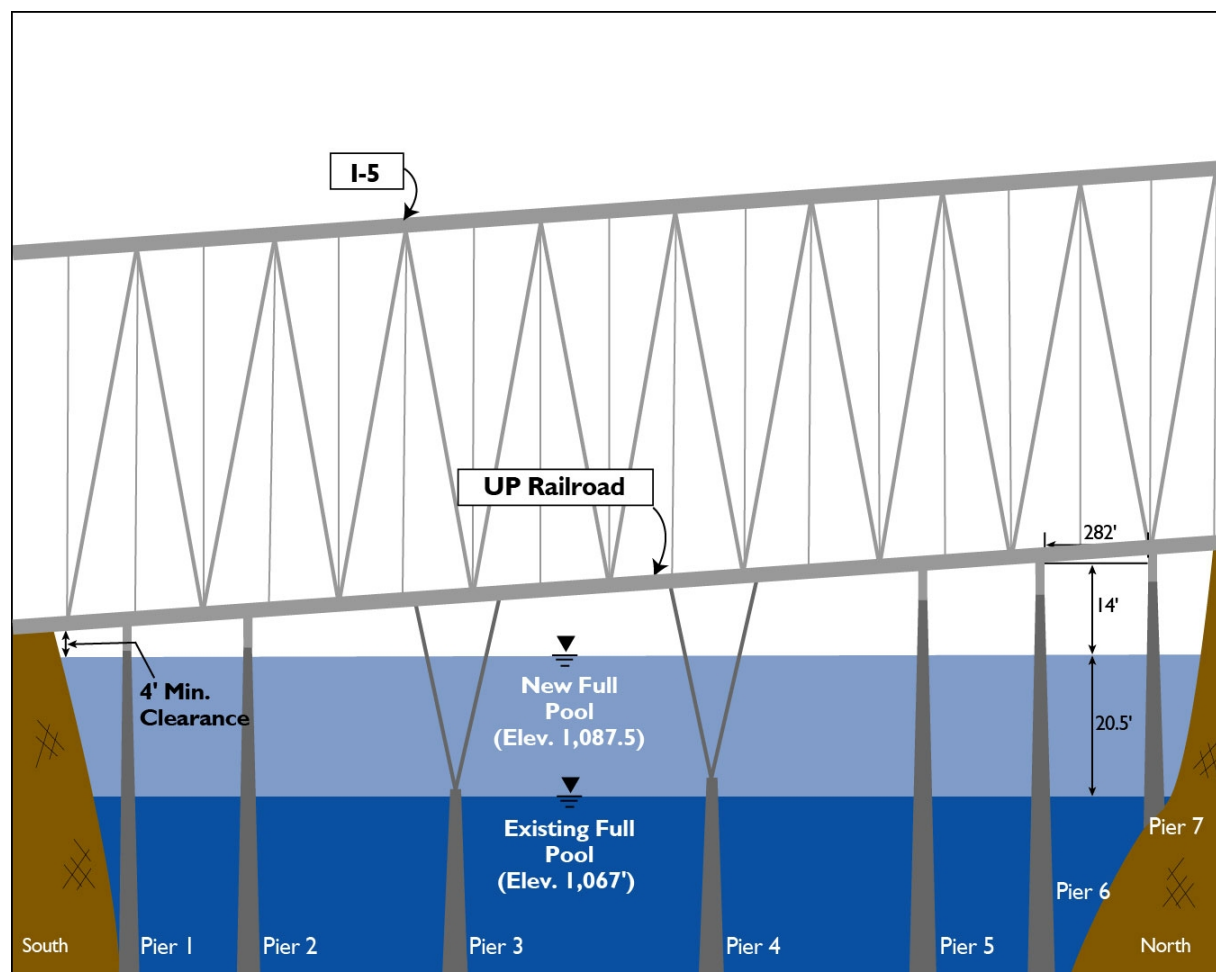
Minimum Clearance for Boat Traffic at Pit River Bridge, Full Pool with 18.5-foot Dam Raise
